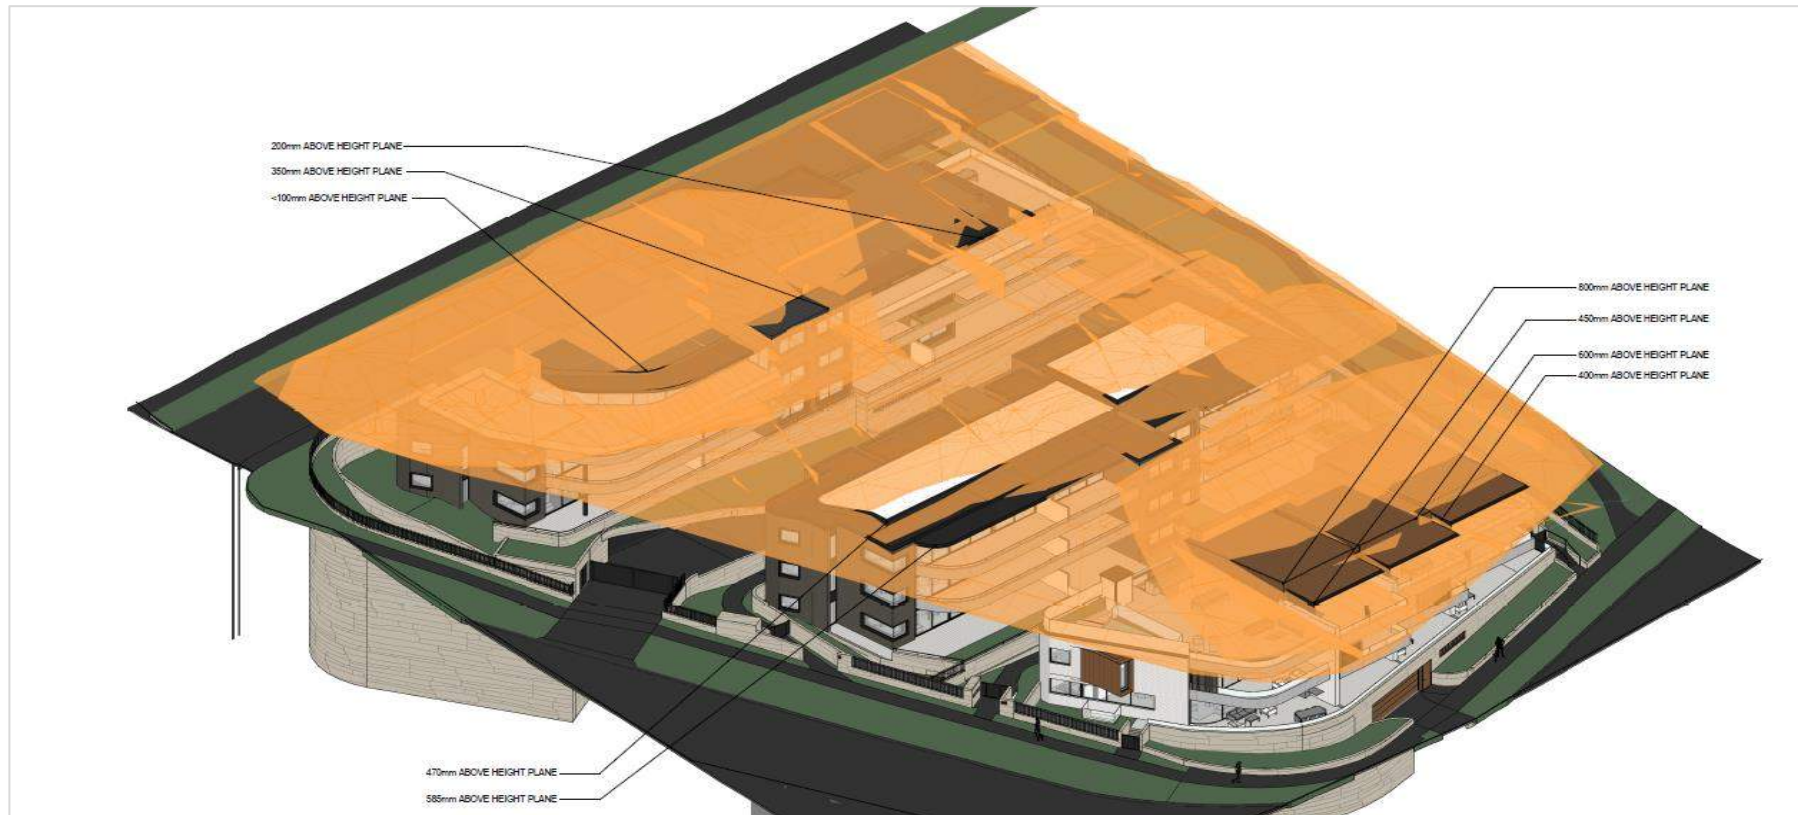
Building Height Plane Diagram showing the height plane in orange and the portions of the building above the height standard subject to this DA (Source: Squillace Architects)
